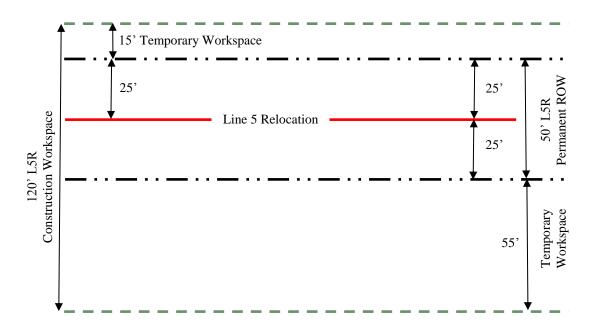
Typical Construction Workspace—Uplands
